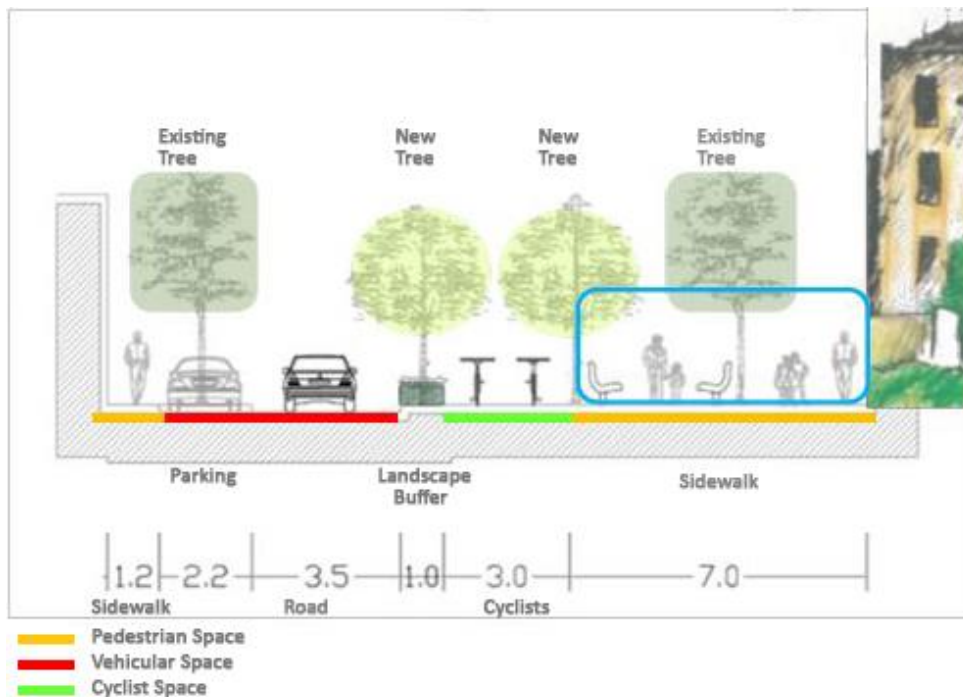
[Street Section of the Proposal Along Damascus Street], Debs
